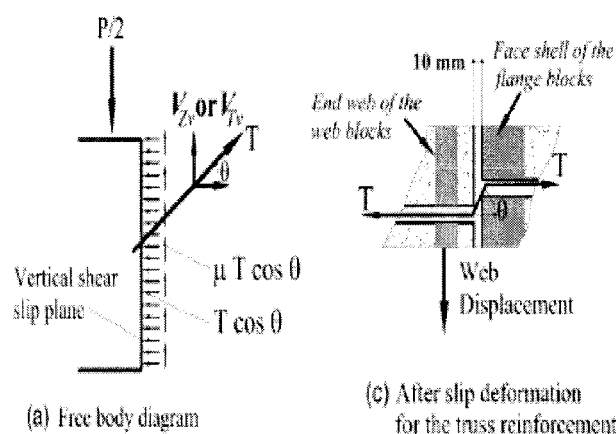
Truss reinforced specimen behaviour proposed by Drysdale et al. (2008)
